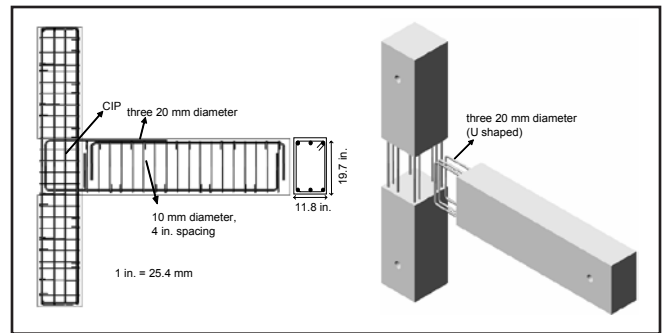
Detail of cast-in-place in column connection. Note: 1 in. = 25.4 mm.
